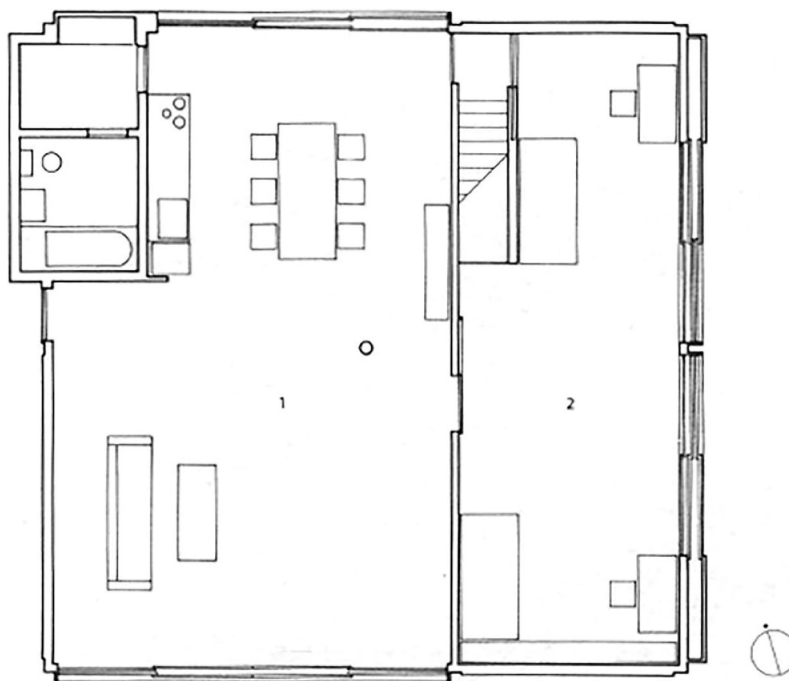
First floor plan of House in White. (Editorial Board of Kazuo Shinohara's collection, 2013, 51).
